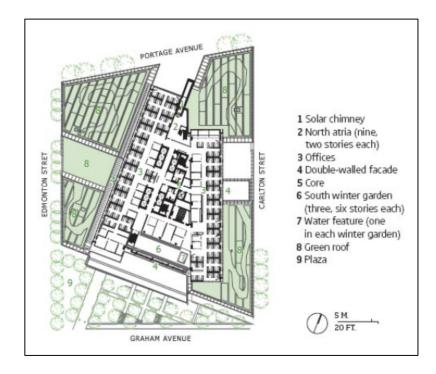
Manitoba Hydroplace Headquarters –typical floor plan
